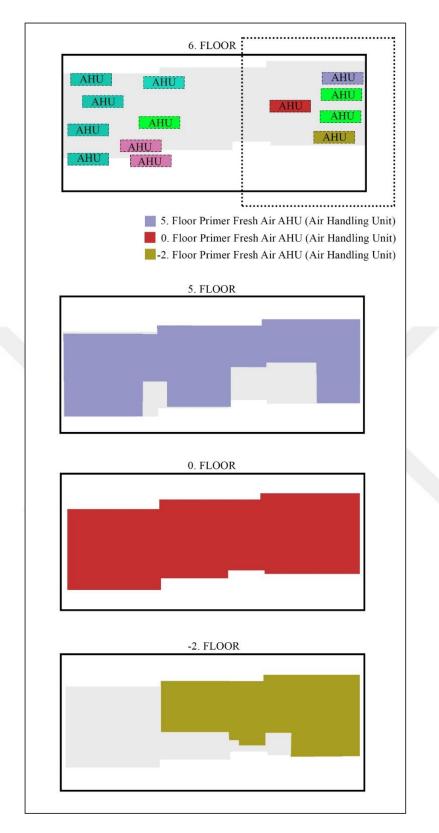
Right Side of the 6. Floor and AHUs' Locations
